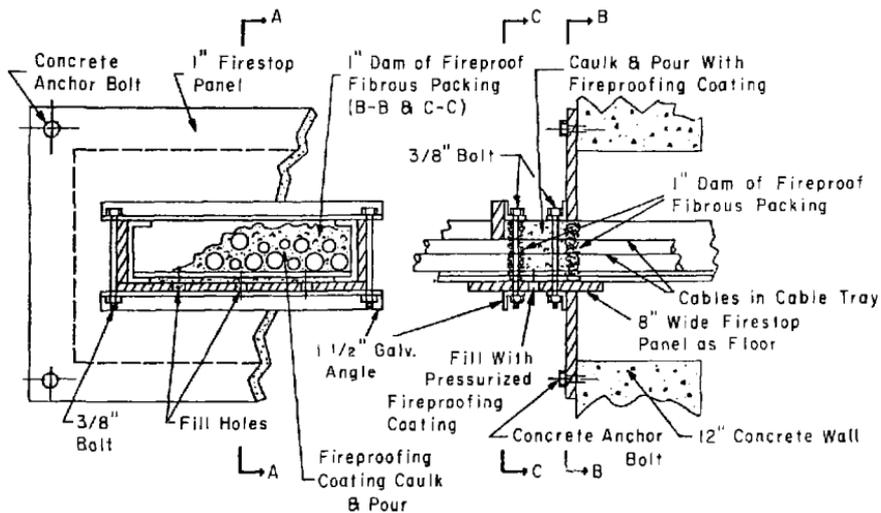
4" Long Fire and Air Seal (Along Cable) (Two Falls of Angle Iron at Sections B-B and C-C).
